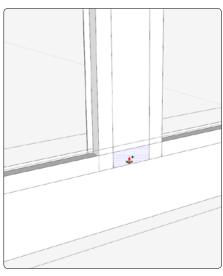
The molding is there, but corners must be coped to fit properly.
